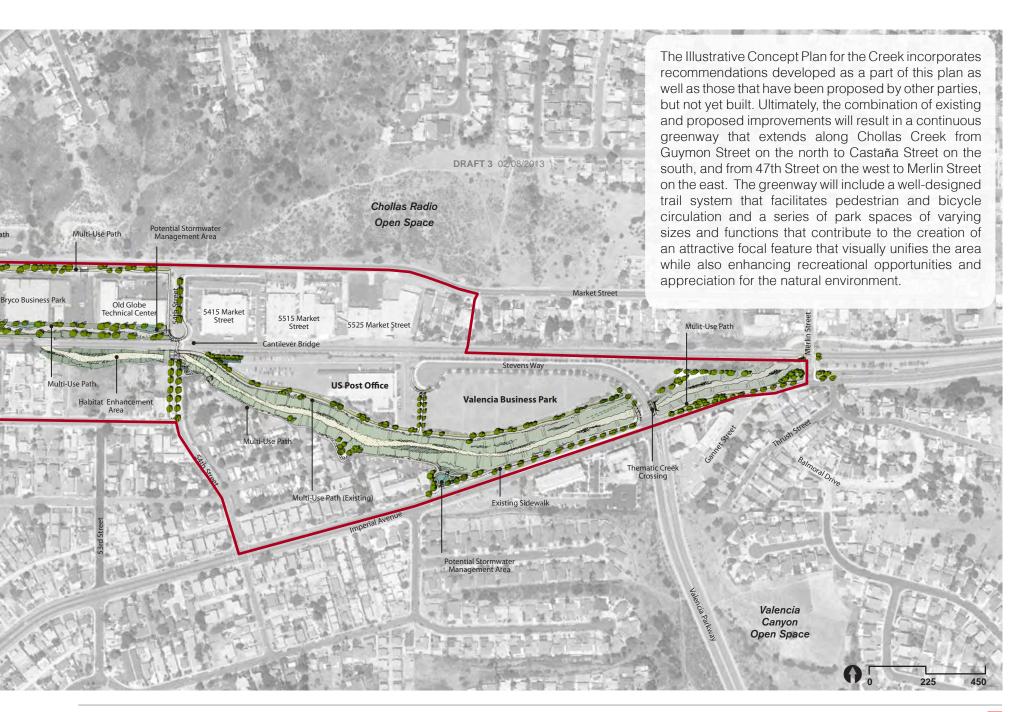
Proposed Overall Chollas Creek Illustrative Plan
